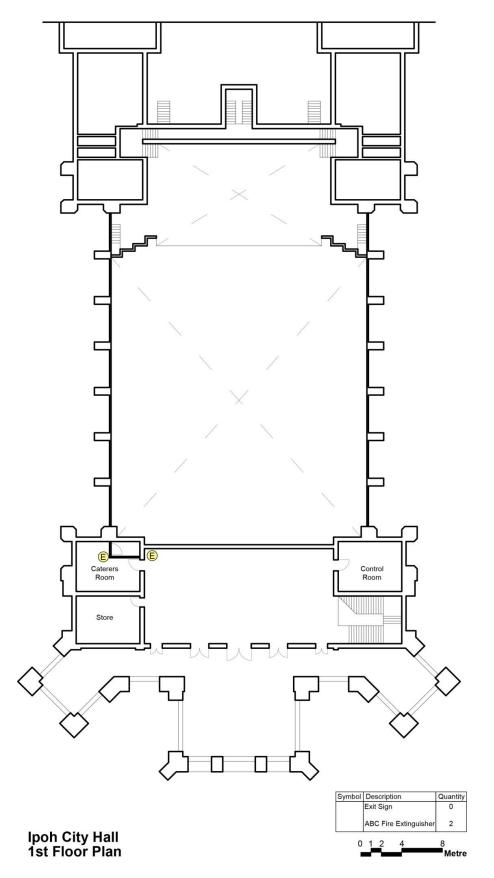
Location of active fire protection measures at First Floor Level of Ipoh City Hall
